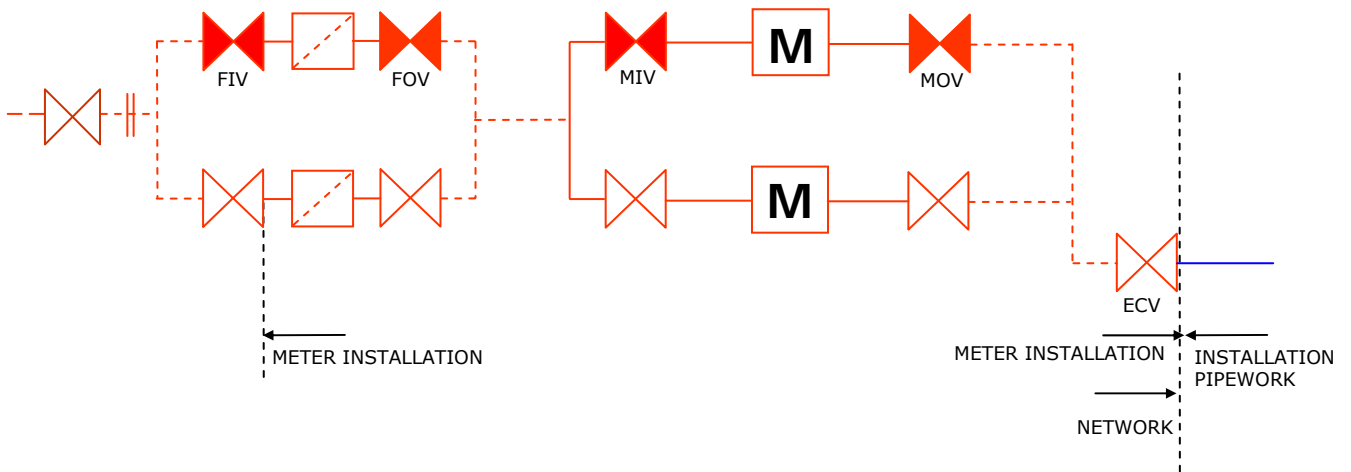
LEGACY ARRANGEMENT. LARGE INSTALLATION. ABOVE AND BELOW GROUND PIPEWORK. ECV LABELLED ON OUTLET
